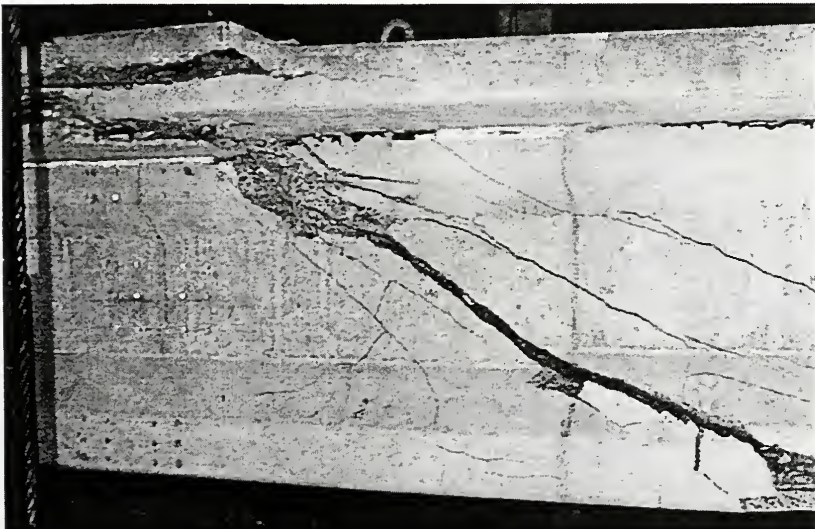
Crushing of Top Flange, Specimen PC6S
